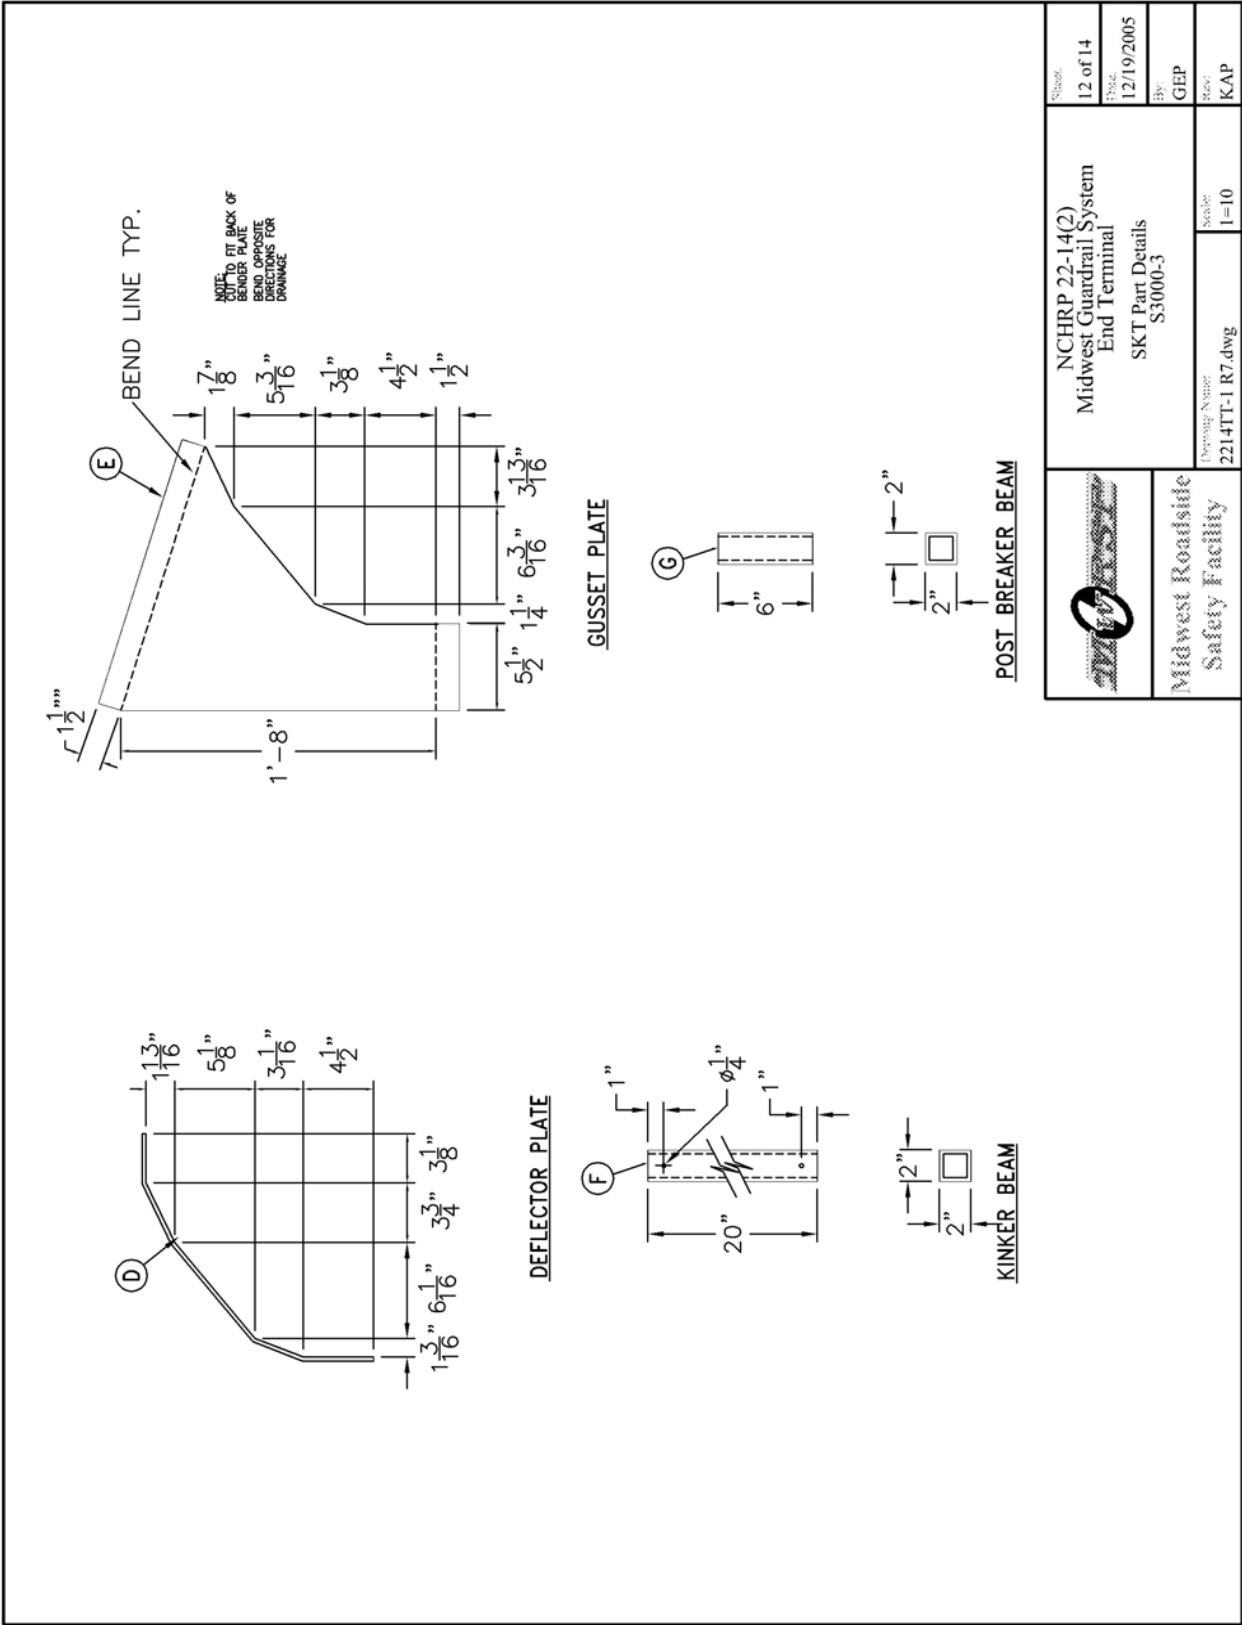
Midwest Guardrail System End Terminal - SKT Head Details (English)
